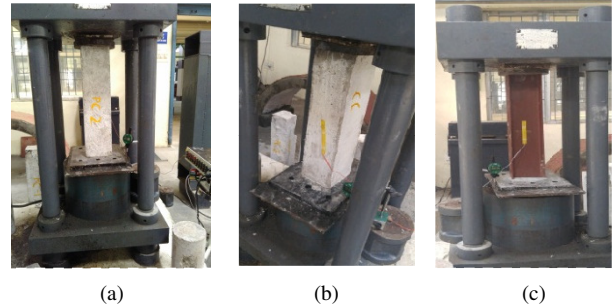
Test Specimens (a) Proposed Composite column, (b) Conventional RC Column, (c) Conventional Steel Column
